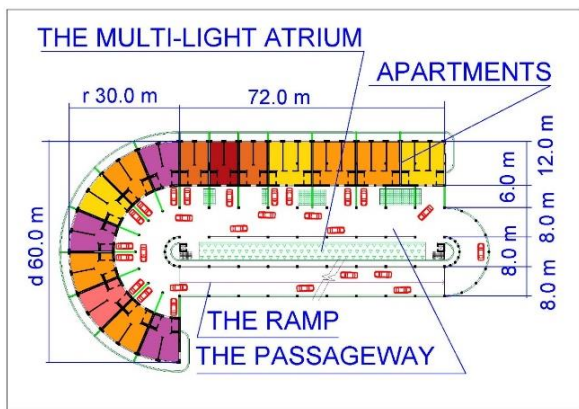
A two-block version of a linear layout of a house with individual parking in front of the entrances to the apartments (arc-shaped car ramps at the ends) – a typical floor plan
